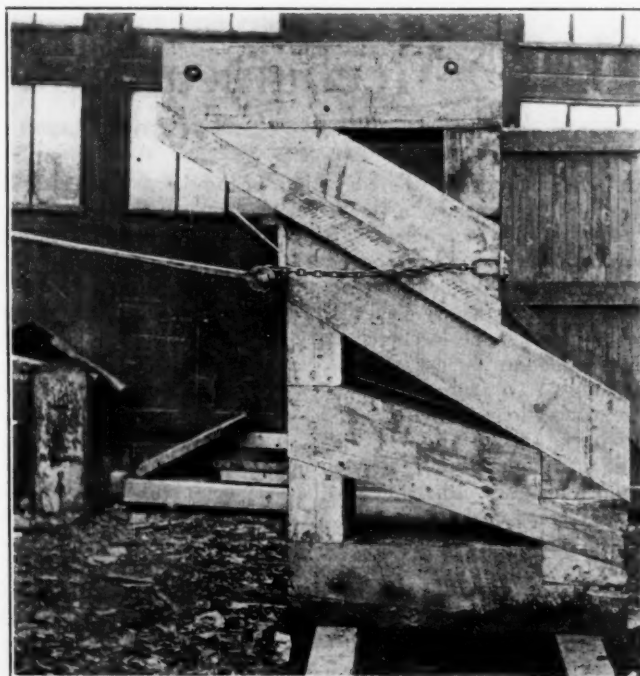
CRIB TYPE OF ROOF-CONTROL MACHINE—SIDE VIEW
